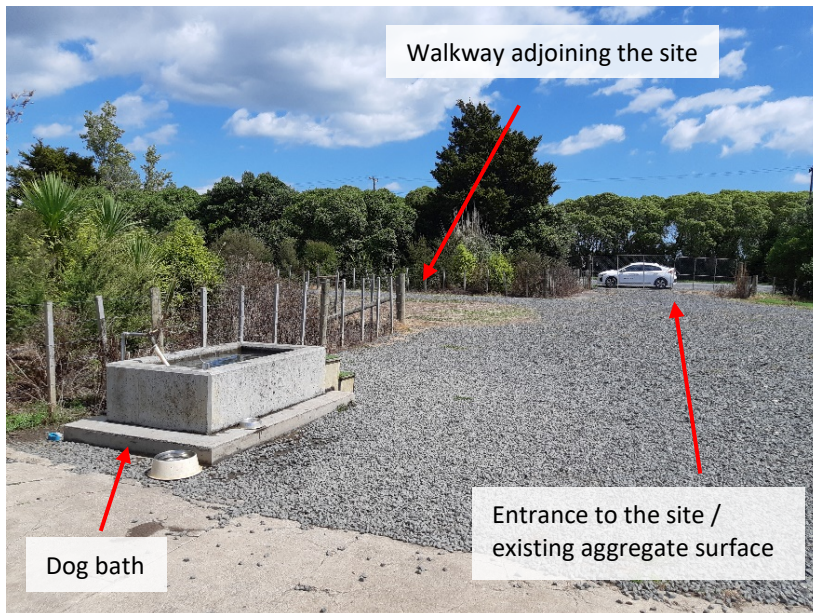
Walkway connecting from Greenwood Road/Ascot Road to subject site and entrance to the site
